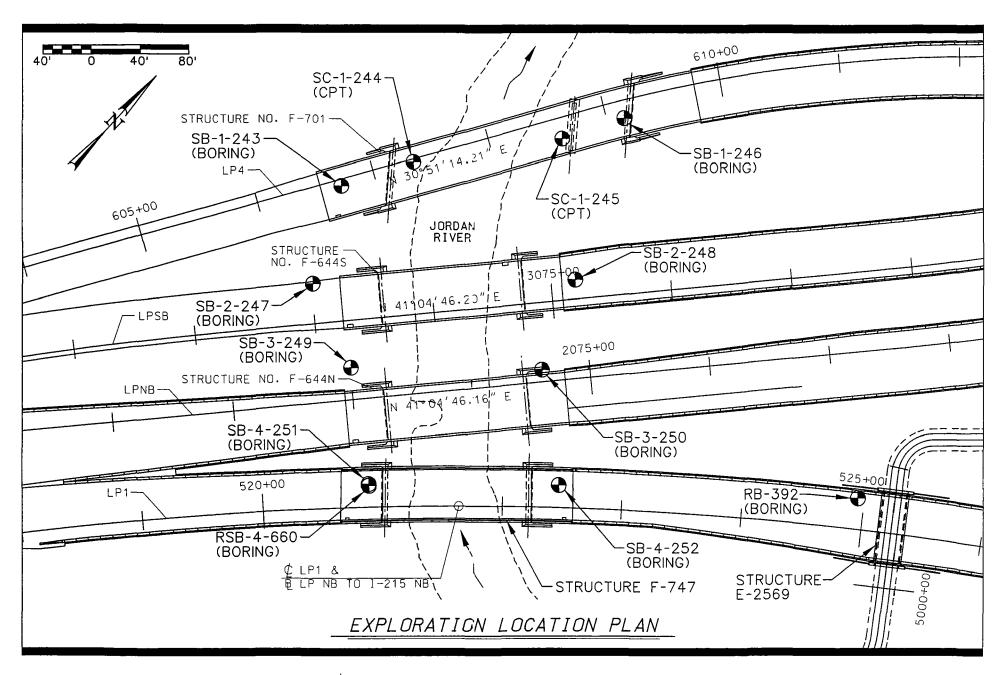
SITE PLAN & TEST HOLE LOCATIONS
